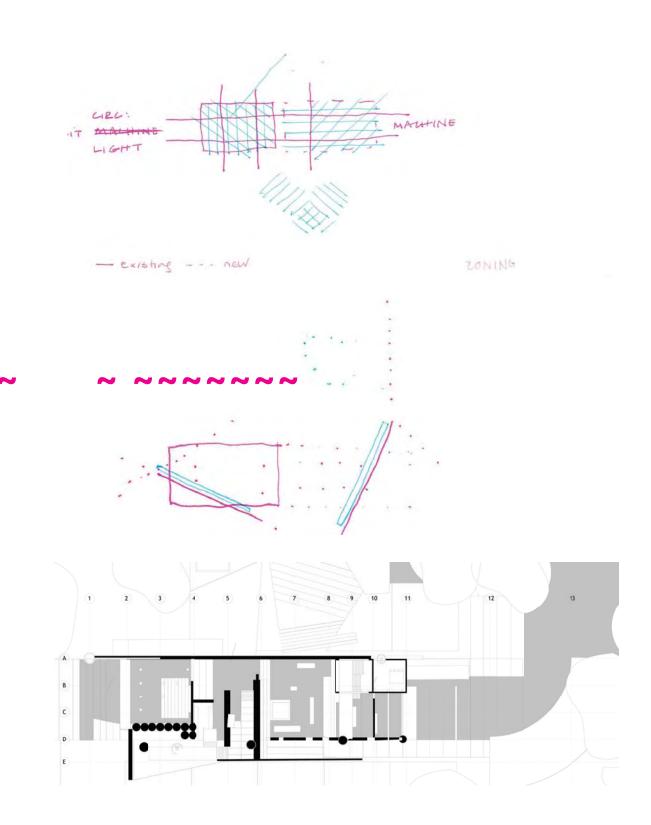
Layers of plan parts- Beacon: Roof structure lattice--- Role Theatre surface floor of public to waste intersection and finally the building that resonates all frequncies.
